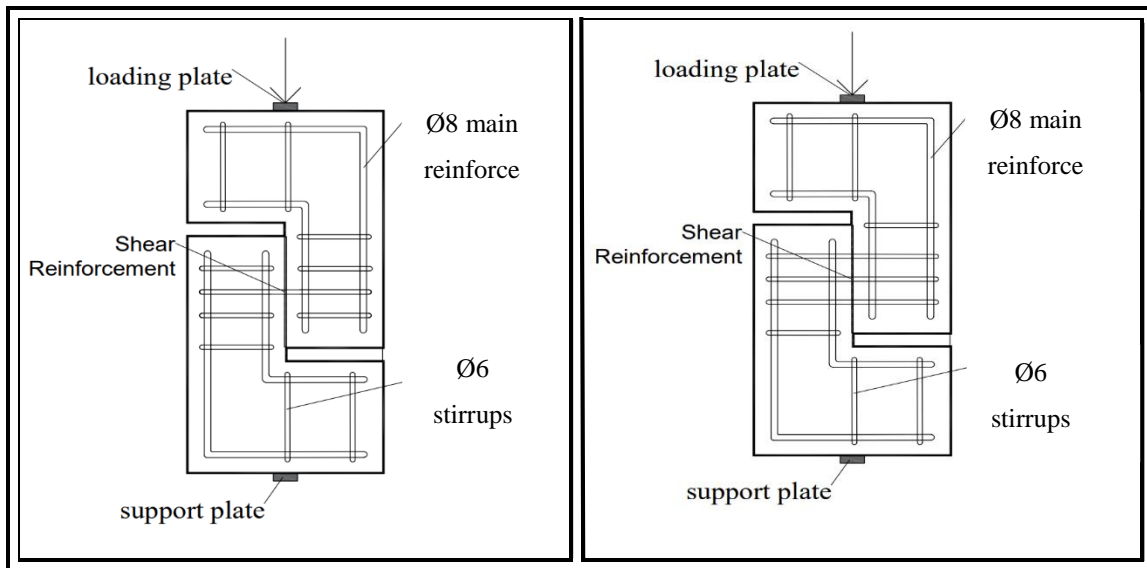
3 Geometric and reinforcement details for Dowel bar specimen.
